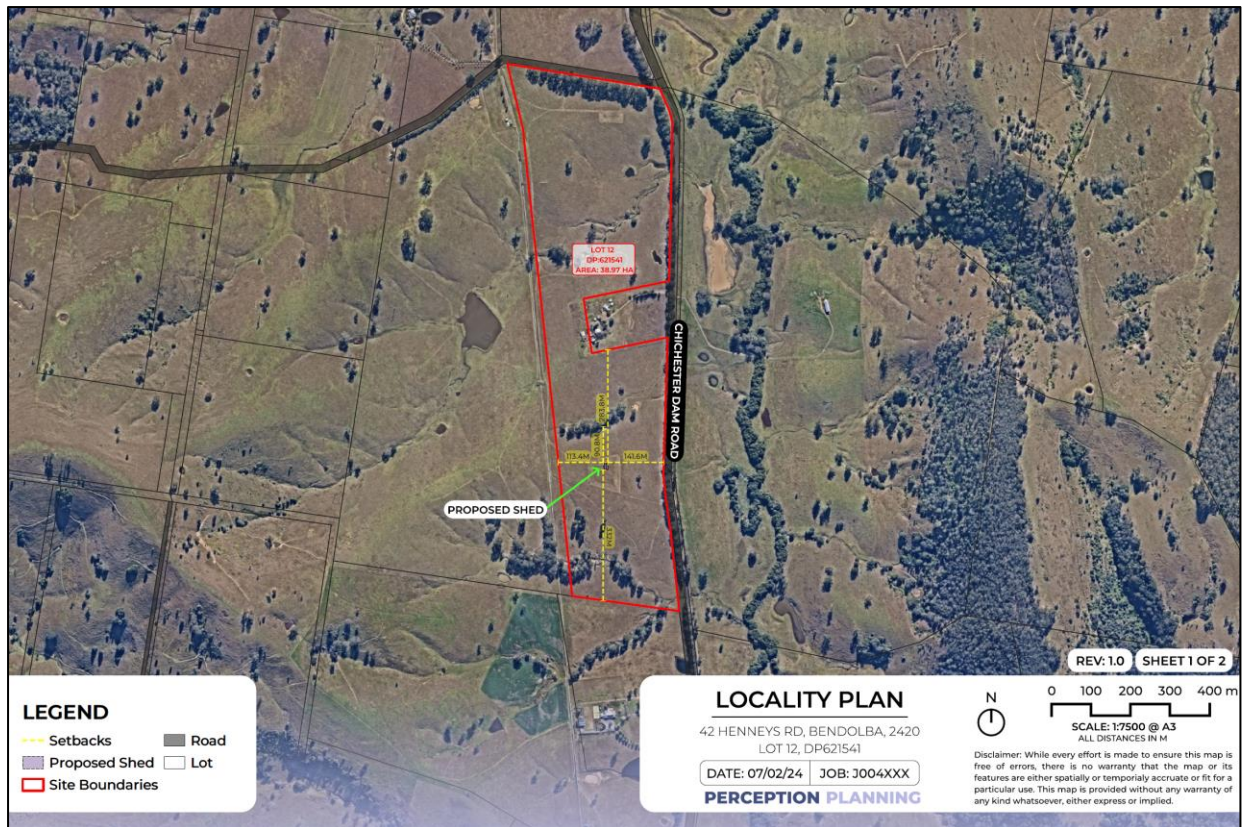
Proposed Site Plan – Farm Building (Source: Perception Planning, 2024)
